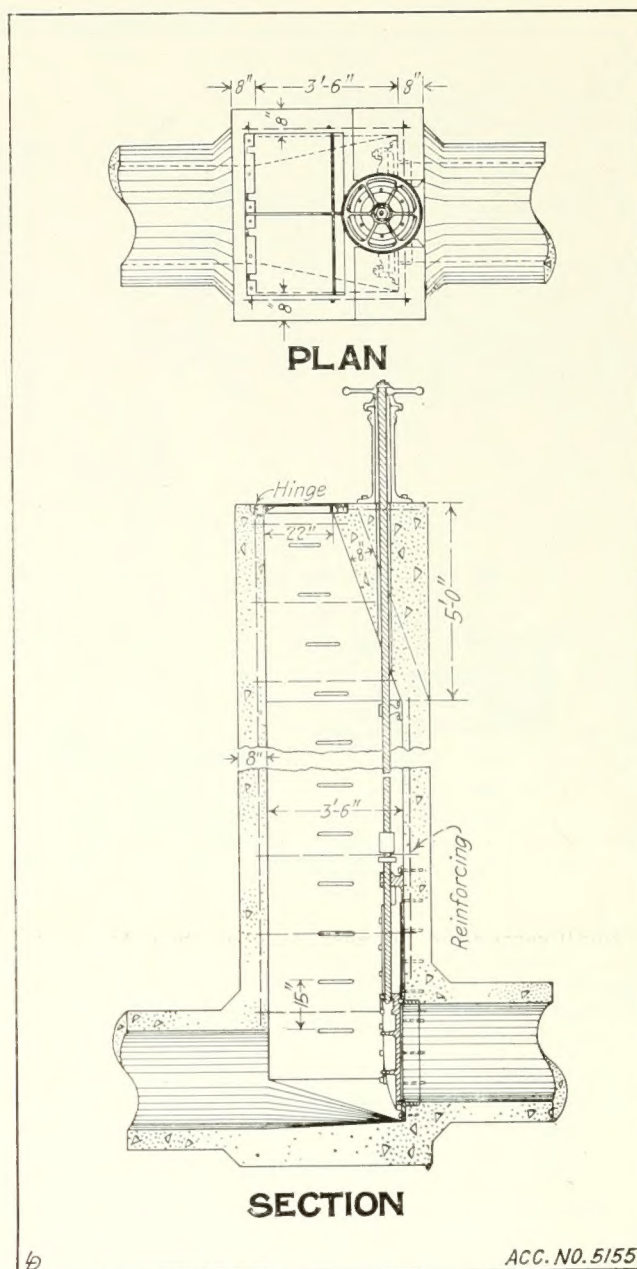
CROSS SECTION AND PLAN OF TYPICAL SLUICE GATE CHAMBER.
